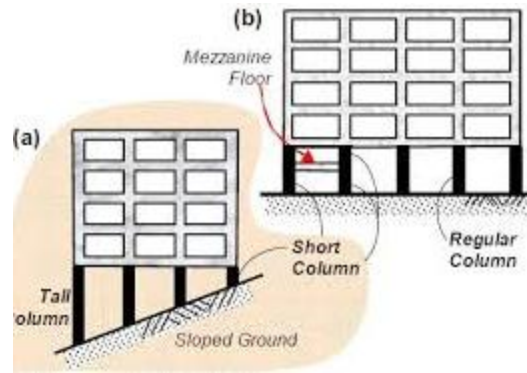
Short column effect: a) building is rested in a sloped ground b) mezzanine floors [Vahidi, 2009]
